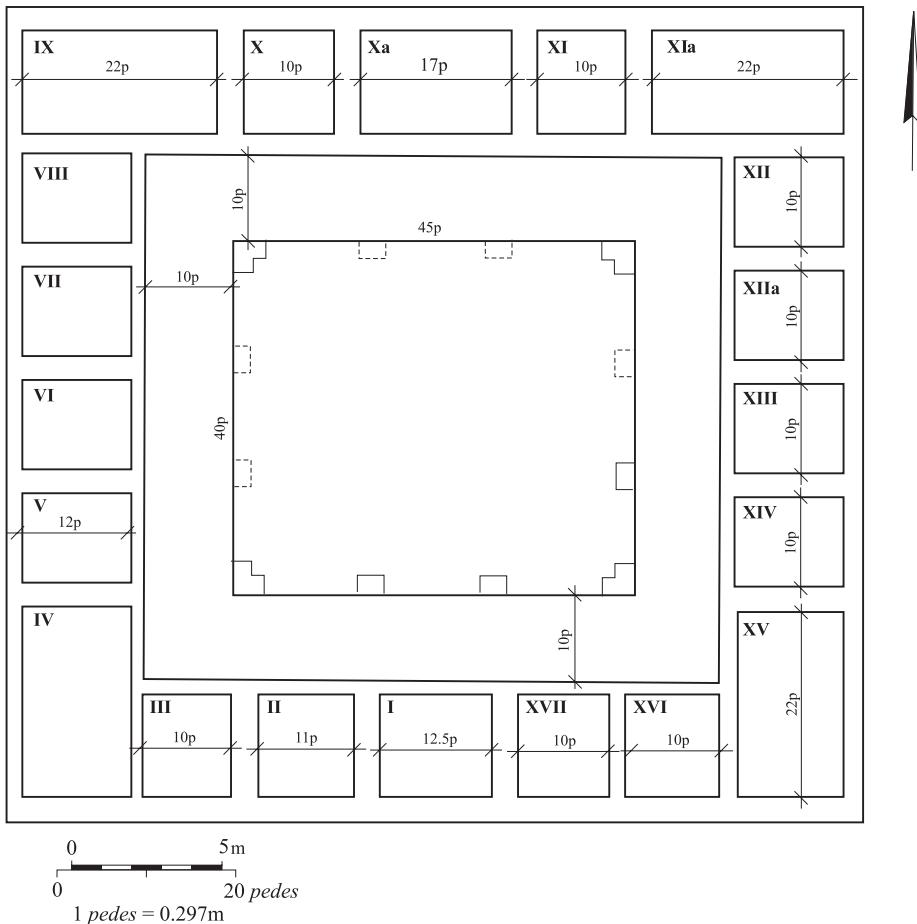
A proposed plan showing rooms with dimensions in original *Pedes*.
